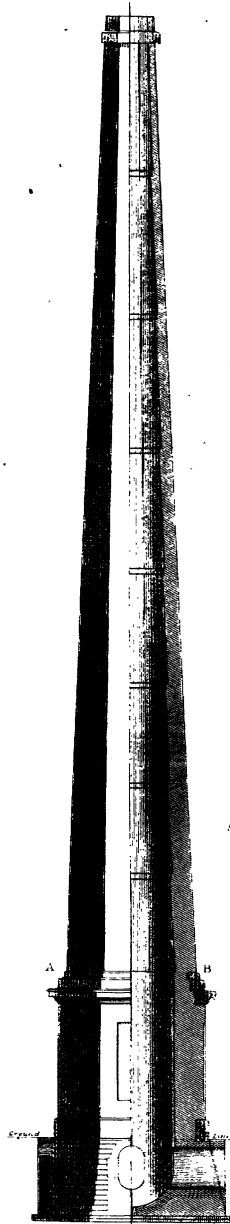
Side Elevation & Bolt Section of Hexagonal Chimney
